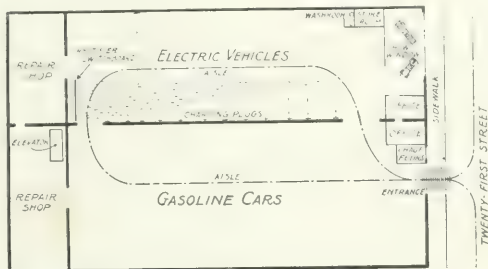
Plan of Twenty-first Street Garage, Toledo, Ohio.
